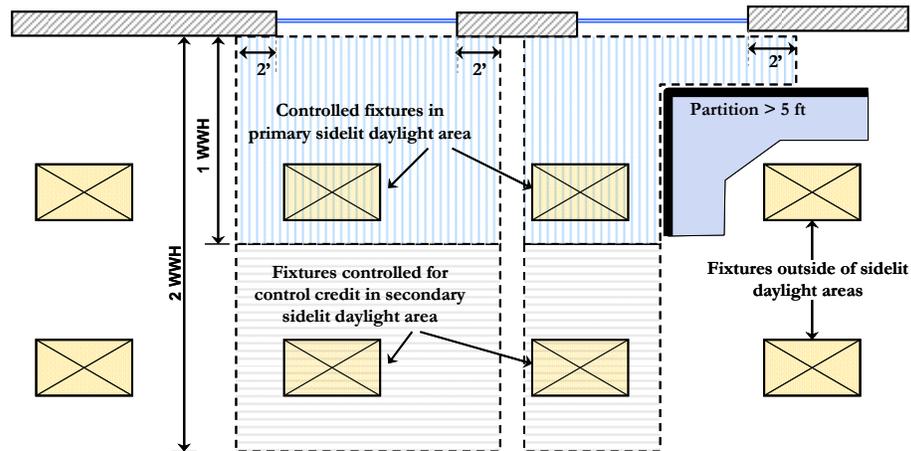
Plan view of primary and secondary sidelit daylight area
